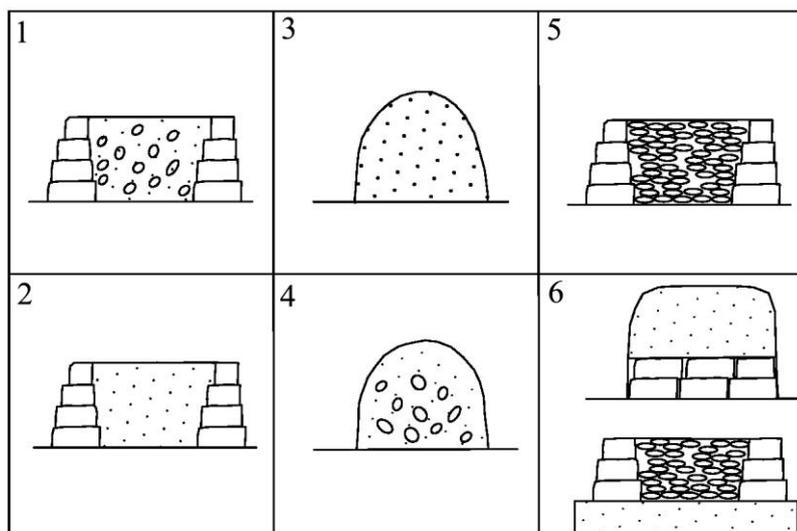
The method and construction material of the Palhae castle's wall: 1. Stone "face"+ stone and earthen fill; 2. Stone "face"+ earthen fill; 3. Earthen walls; 4. Stone-earth; 5. Stone wall; 6. Mixed construction.
